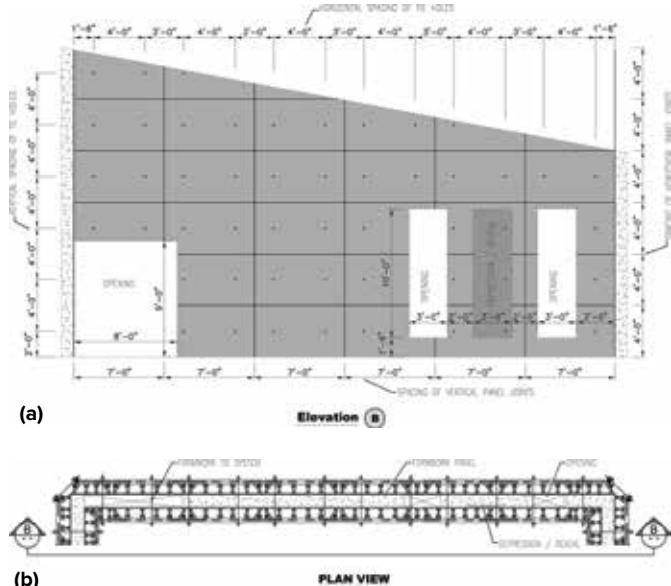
Job-built formwork: (a) use of gangs 4 x 8 ft, and form face appearance elevation (Fig. 4.1c in ACI PRC-347.3-13); and (b) form plan (Fig. 4.1d in ACI PRC-347.3-13)
